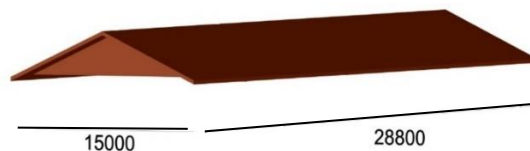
3 Gable Roof Projection of Usman Dormitory (Building A)
